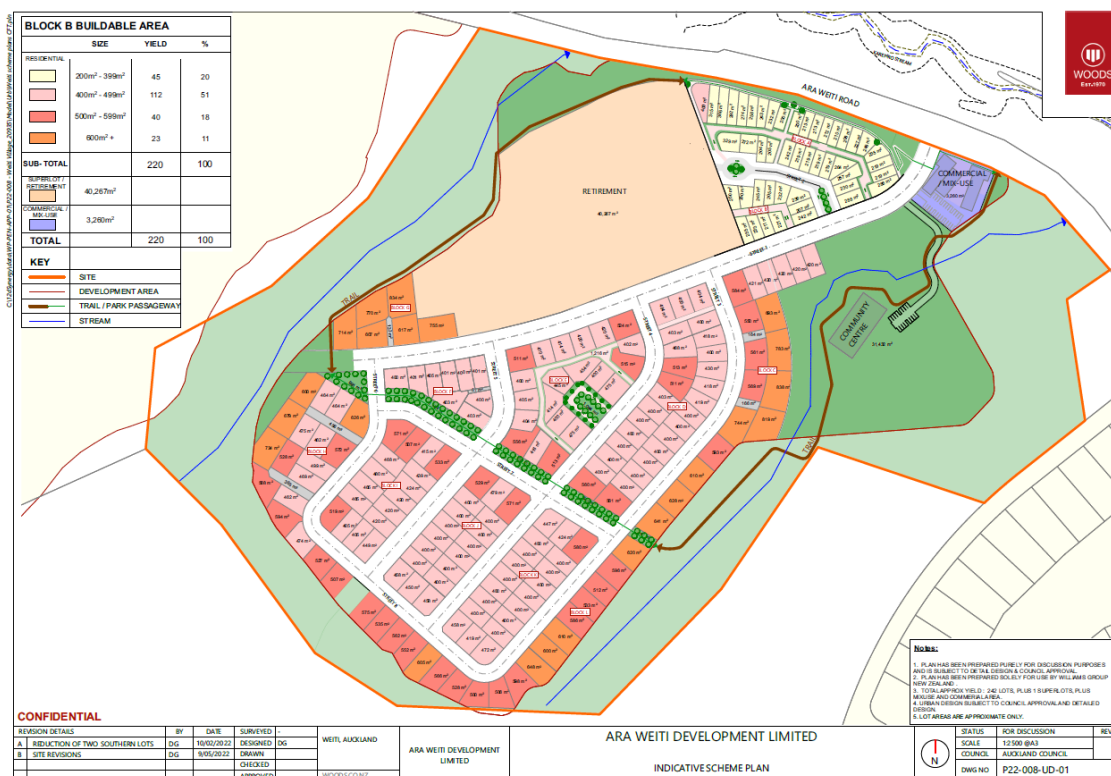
Woods Indicative Scheme Plan of the Village 1 Site.
